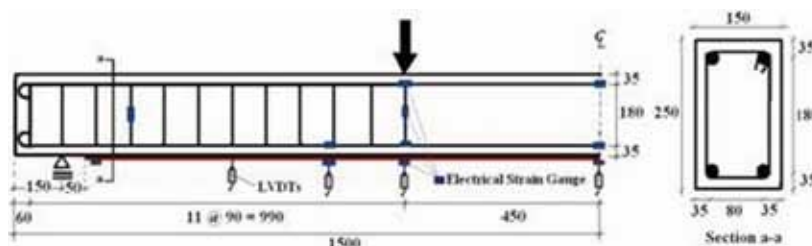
Beam Details and Measurement Schemes for Half of the Test Specimen (unit: mm)
